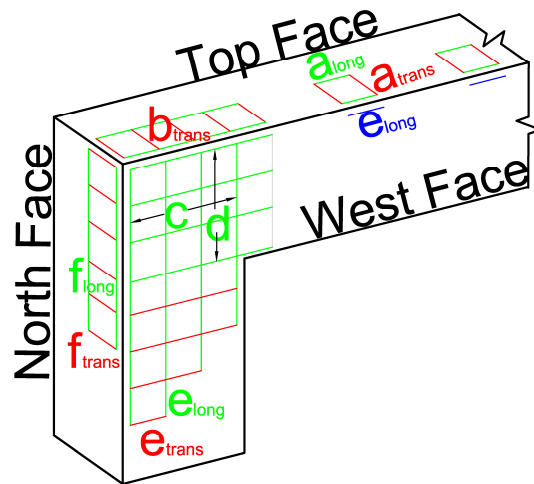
Reinforcement Layout of C-Beam Specimen.
